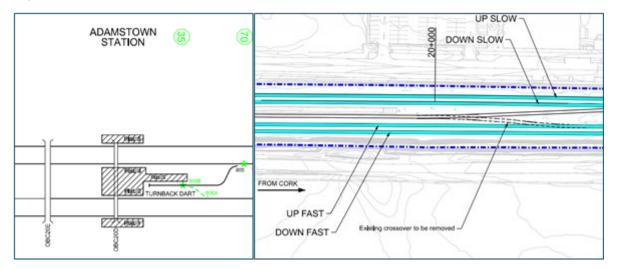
Adamstown Station – Track Plan Layout (1 of 2)
